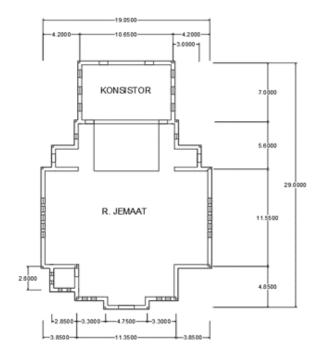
floor plan and dimensions of GPIB Bethel Bandung
